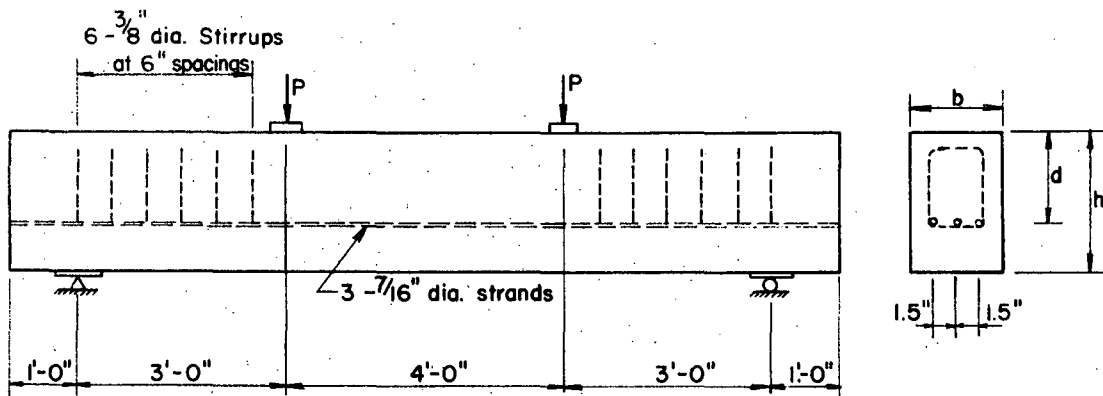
DETAILS OF BEAM TEST SPECIMENS
